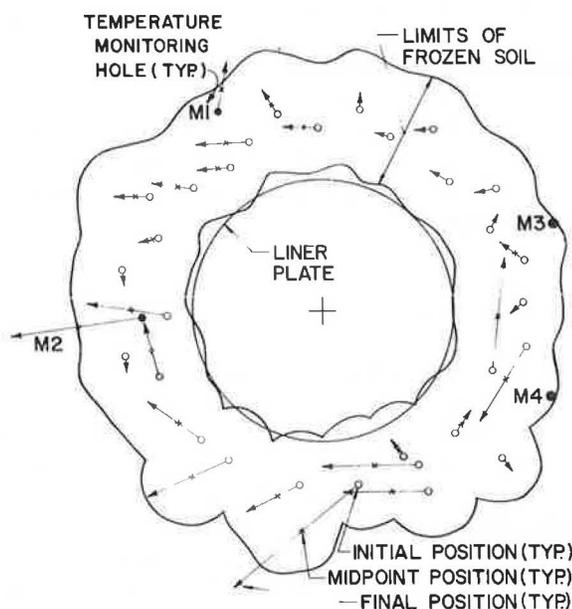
Cross-section view through tunnel showing horizontal freeze pipes and approximate frozen ground envelope beneath railroad tackage.
